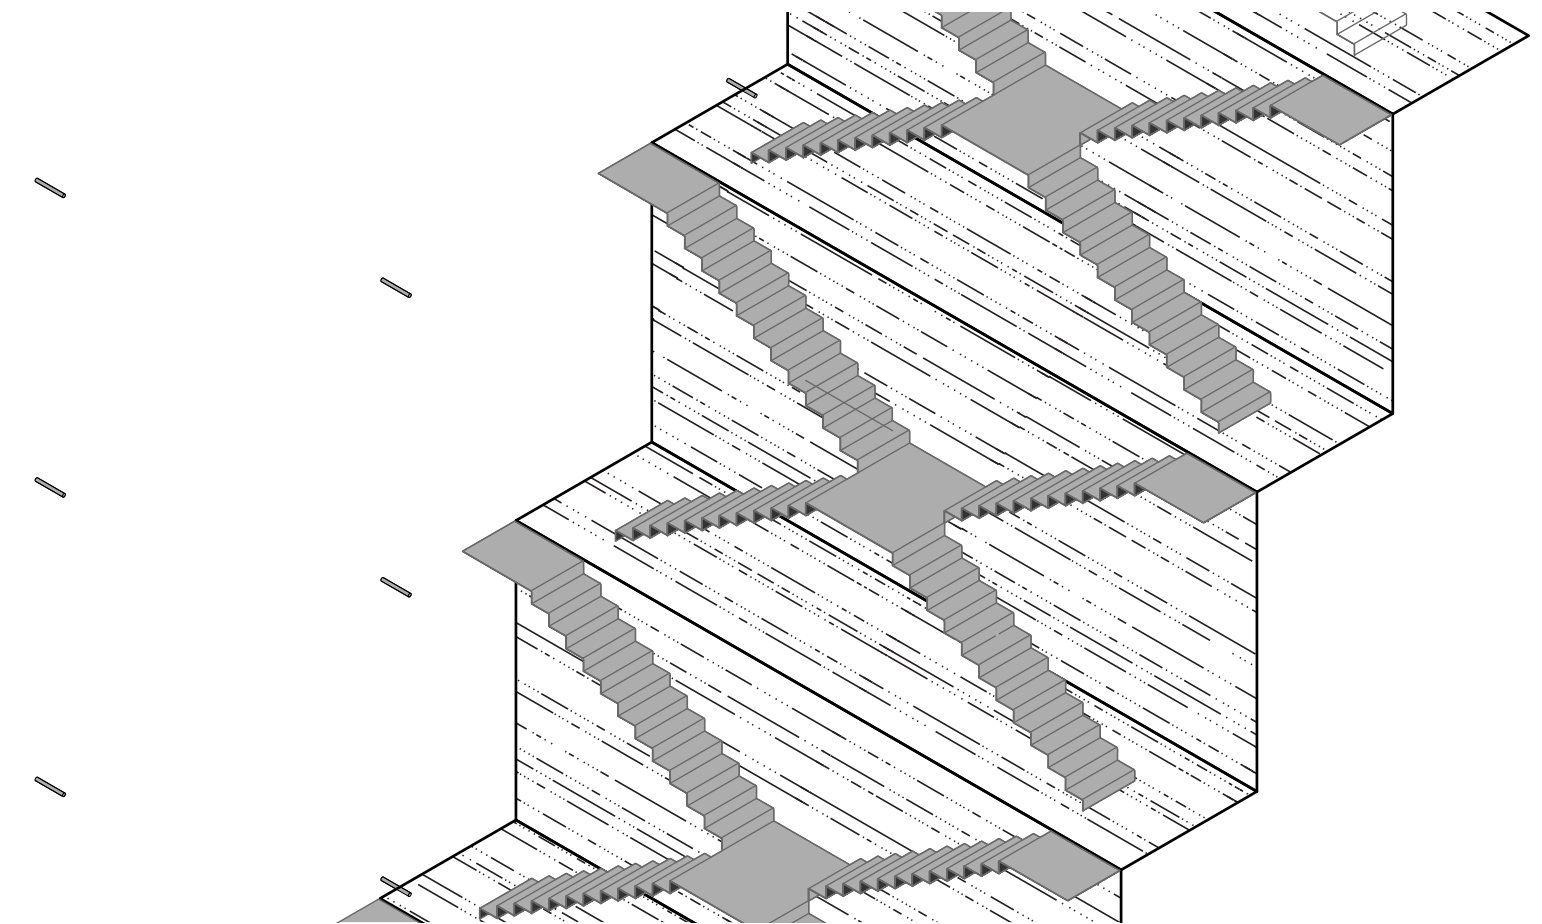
Axon of stair construction. The bent stainless plate stair assemblies would be constructed off-site and installed on the rock
